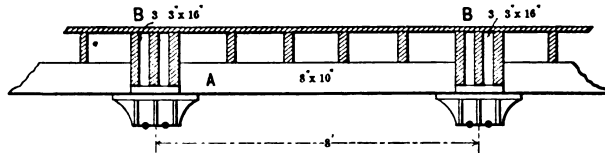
Cross Section Through Floor.—Scale, 1/4 Inch to the Foot.
